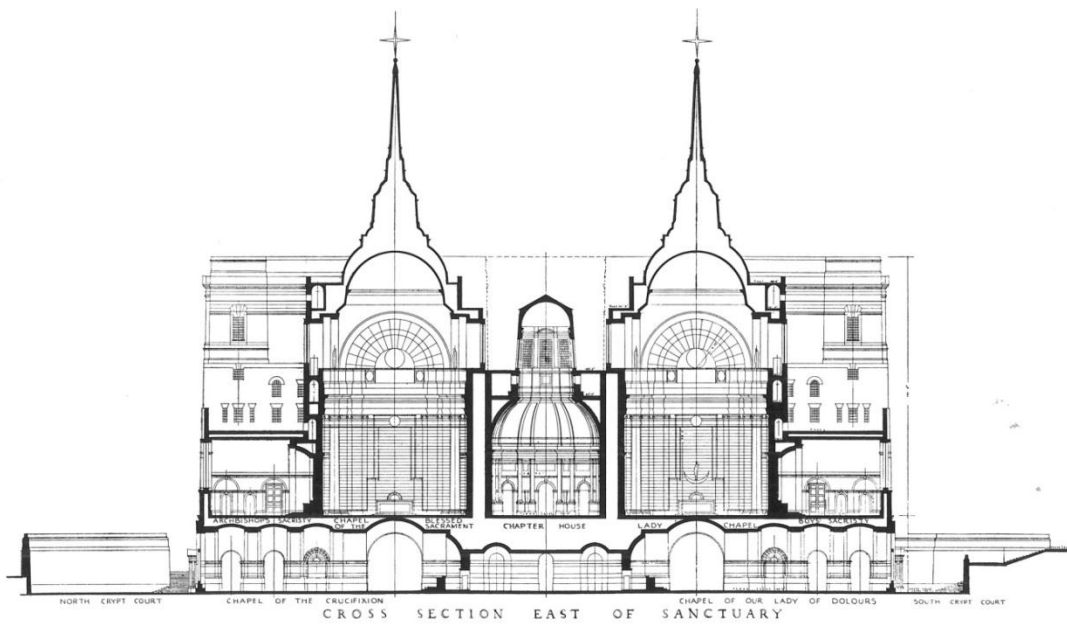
Original cross section drawing to the east of the Sanctuary is presumed to be a straight section cut as there is no indication of a stagger on the plan. Image credit: Butler (1950, plate C1).
